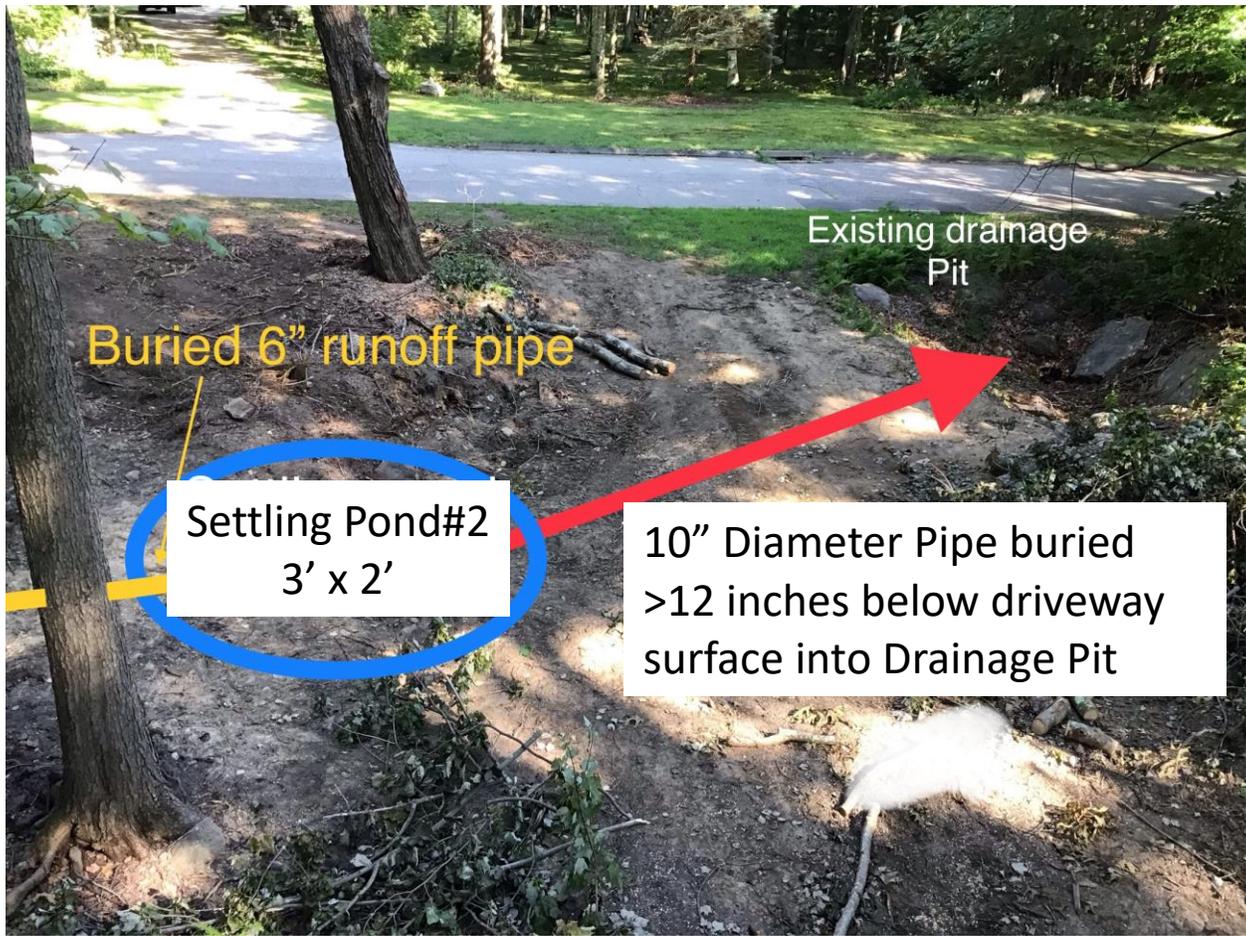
Settling Pond #2 and pipe underneath driveway extension
